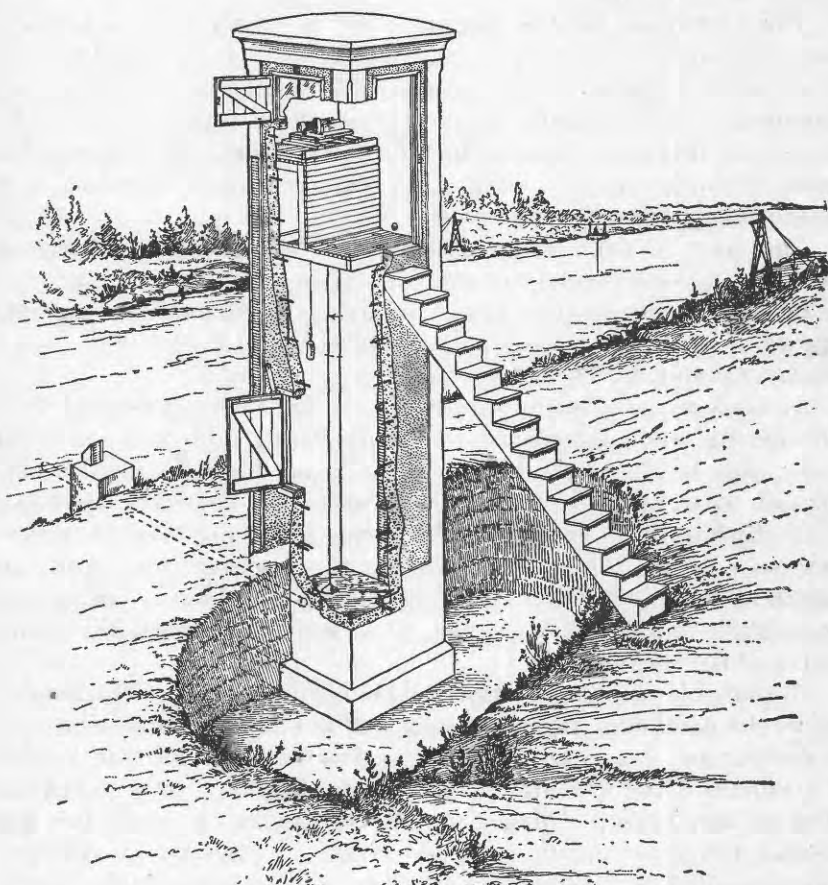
Typical river-measurement station showing concrete well and house for water-stage recorder and staff gages, cable, and car
